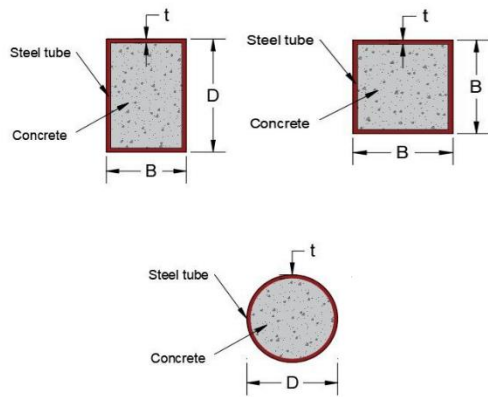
Typical Concrete-Filled Steel Tubular Cross Sections.
